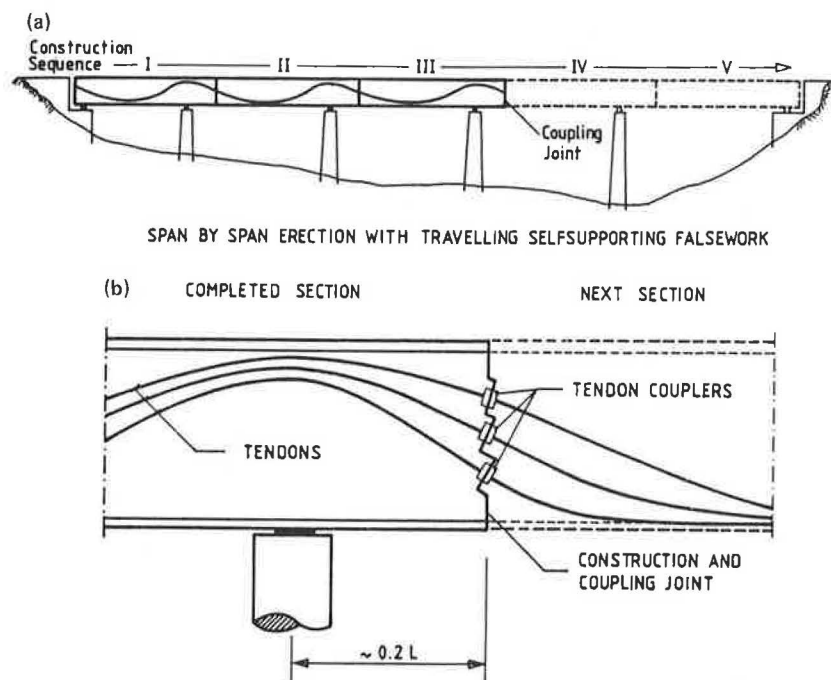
Coupling joint: (a) Possible geometry of bridge structure with coupling joints; (b) Coupling joint detail.
